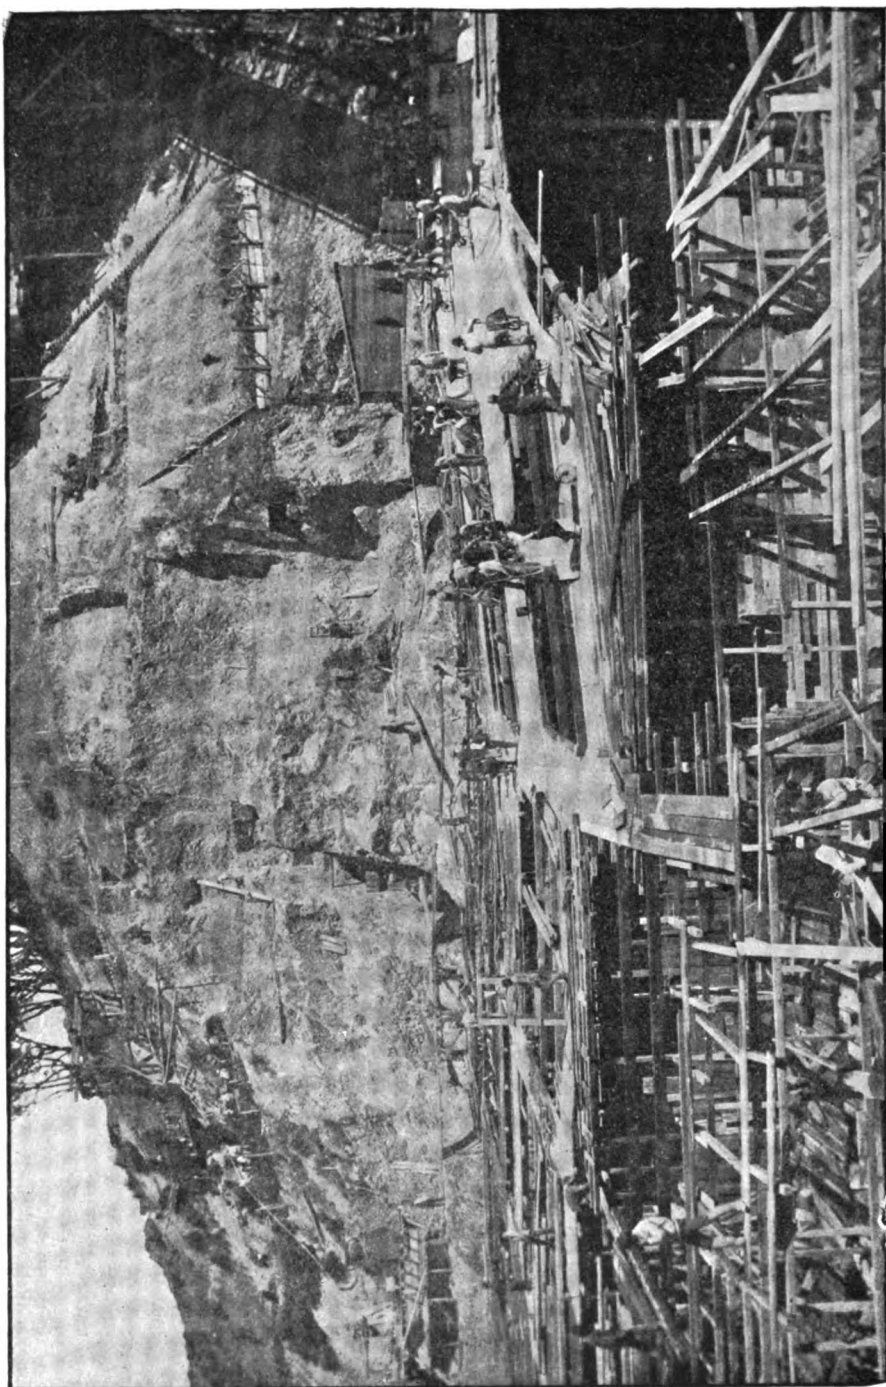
MOULDS FOR CONCRETE BLOCKS, SAN MATEO DAM.
